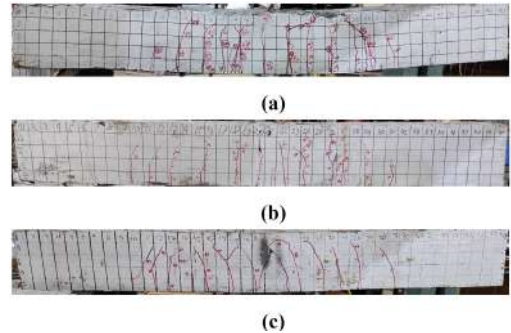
Crack patterns of HVFA-SCC control beam test specimens: (a) K-12-NS, 12 mm rebar; (b) K-16-NS, 16 mm rebar; (c) K-19-NS, 19 mm rebar.
